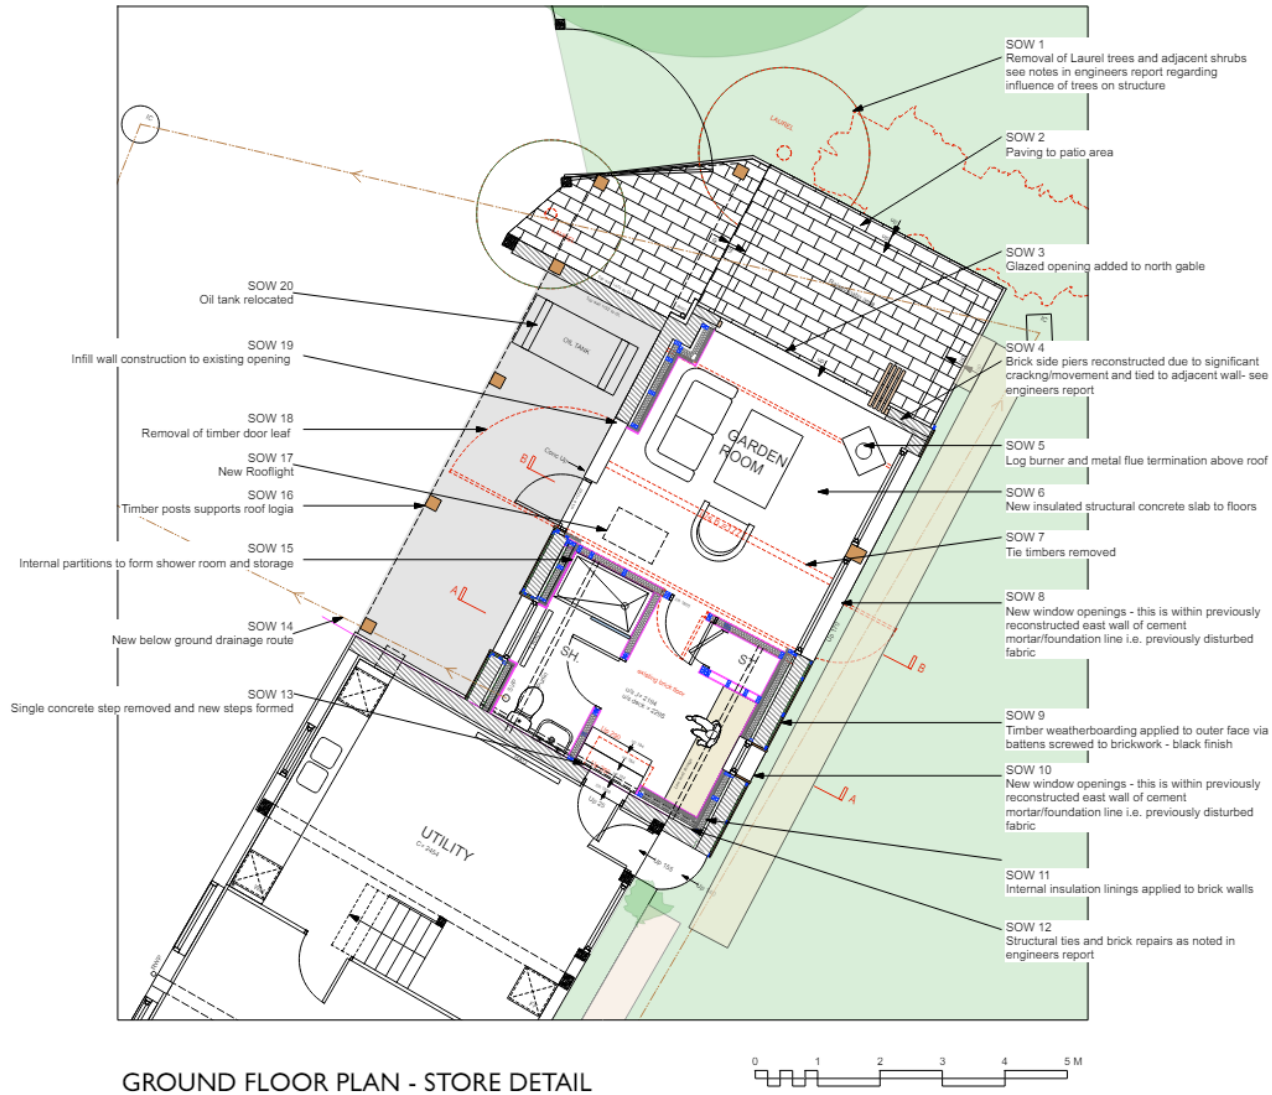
Proposed site plan. Created using drawing no.05 PROPOSED GA PLAN produced and copyrighted by Beech Architects Ltd. Beech Architects have given full permission for the replication of their work.
